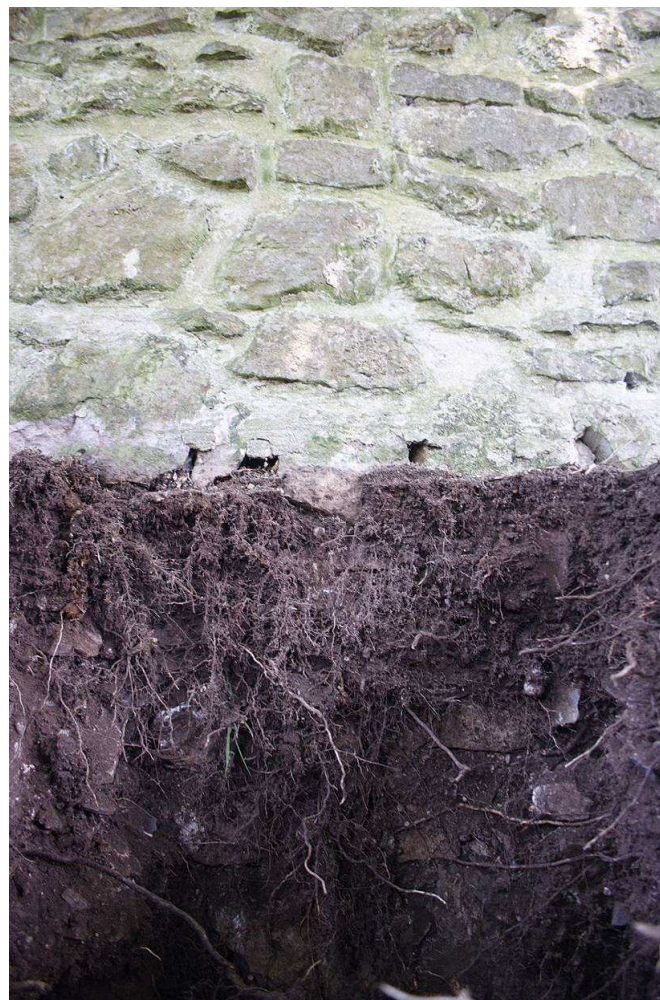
Inner face of eastern boundary wall below current ground level, as revealed in the investigation pit
